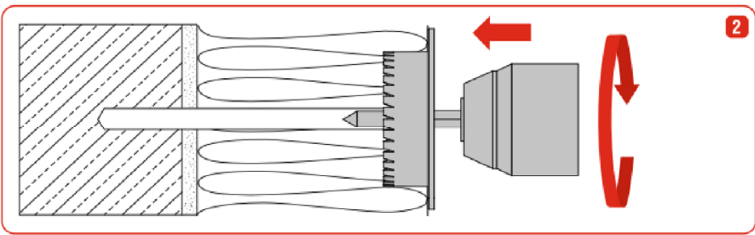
Drill the recess for immersed installation with appropriate drilling tool WK-FT/WK-FM.
